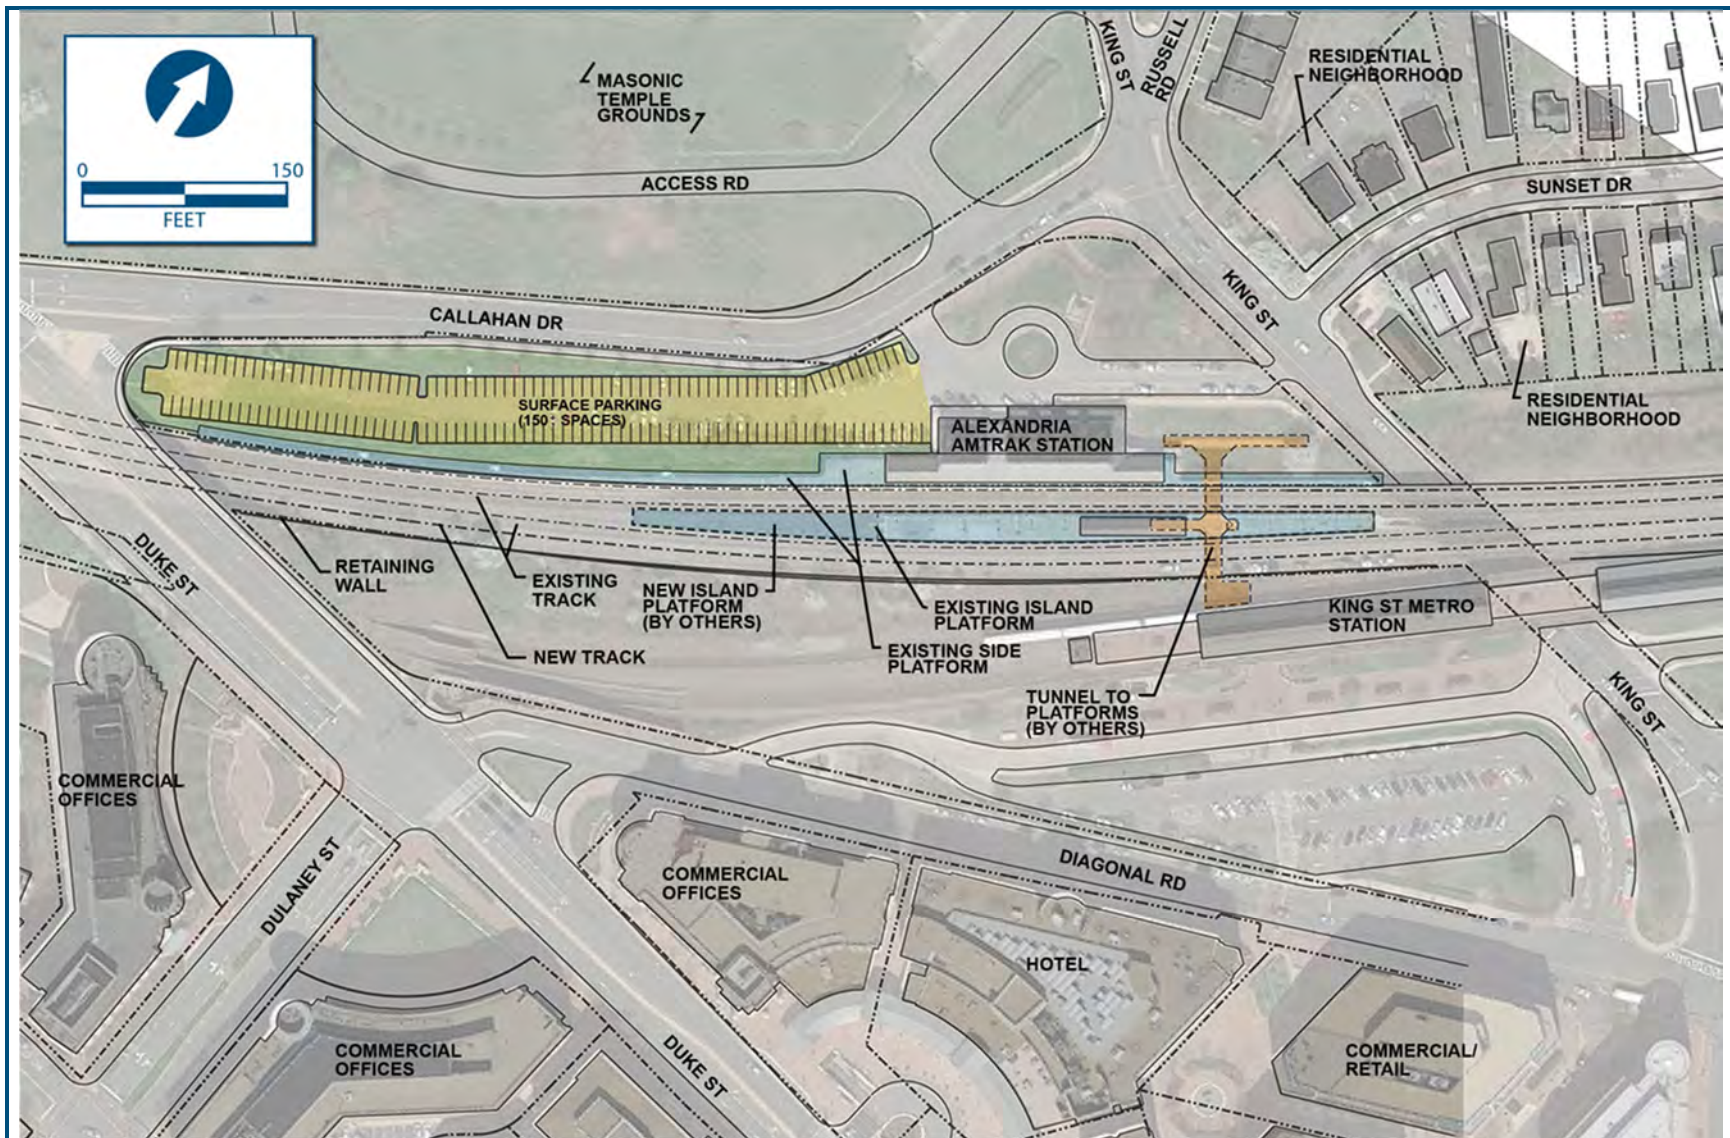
Alexandria Station Improvements for Build Alternative 2A
